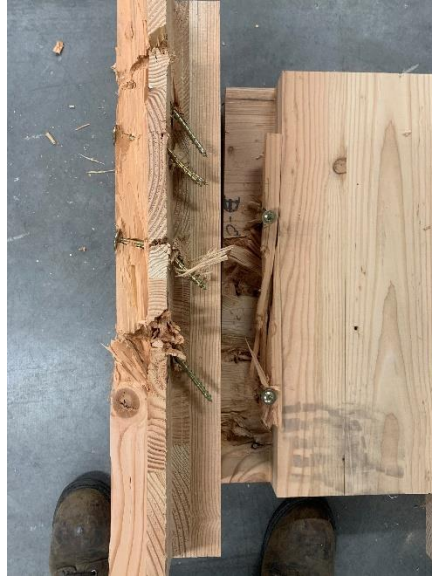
Fasteners Failing in Shear and Withdrawal
